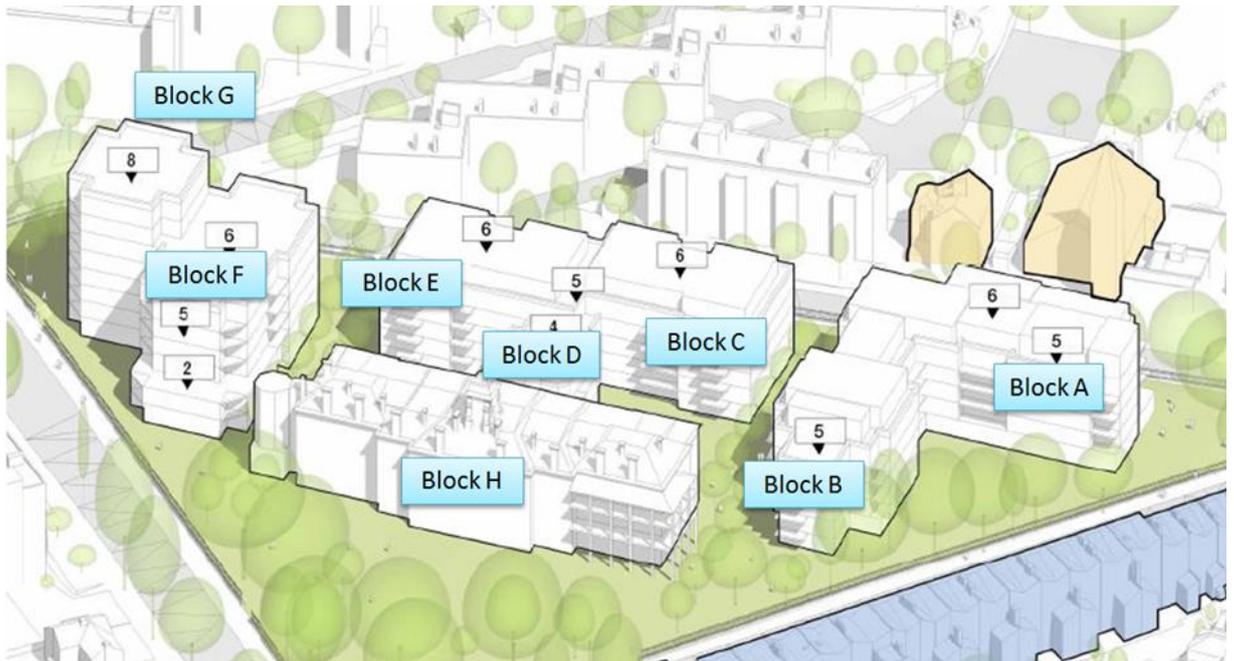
The massing of the scheme showing building heights. The proposed 3 new buildings are internally subdivided into 7 sub-blocks (A-G) reflecting the stair and lift cores to the 3 new buildings.
